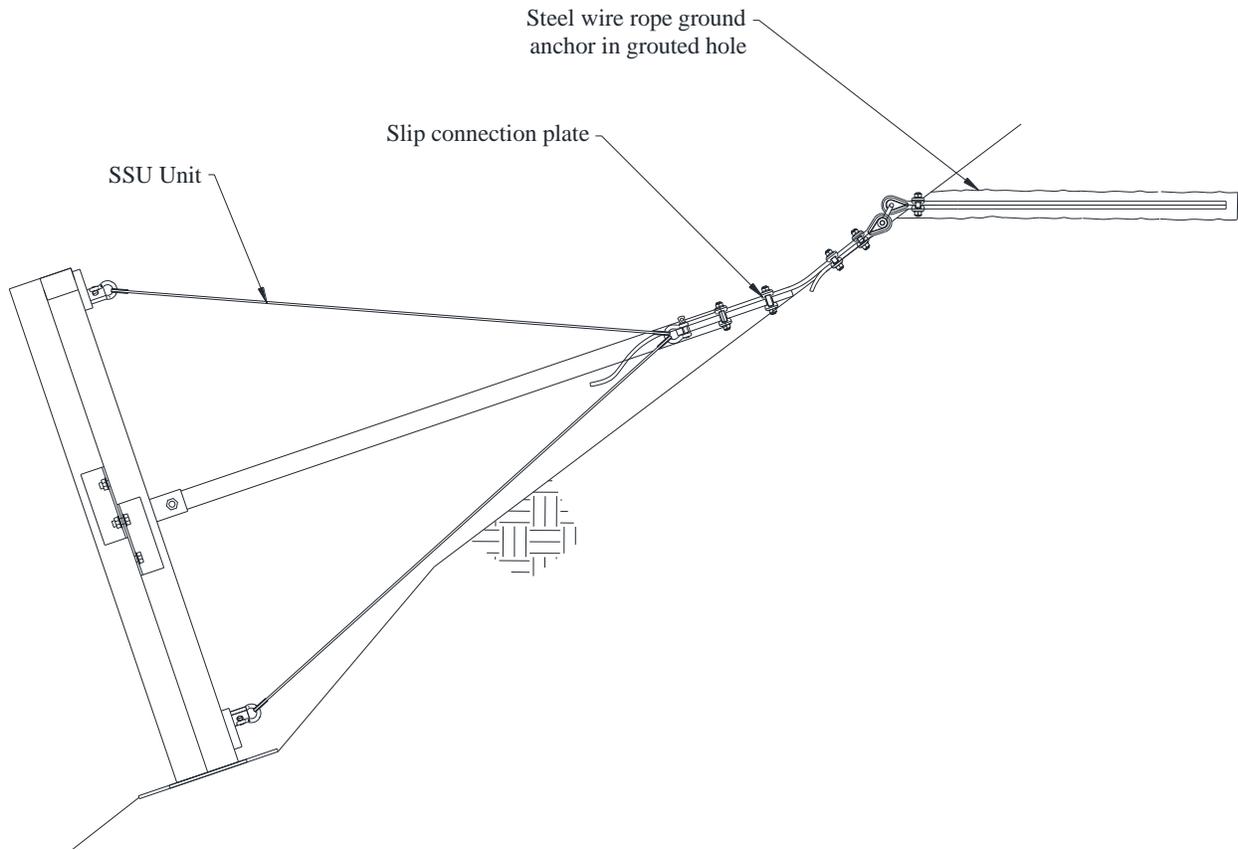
Side elevation view of the SSU unit and foundation installed on slope
